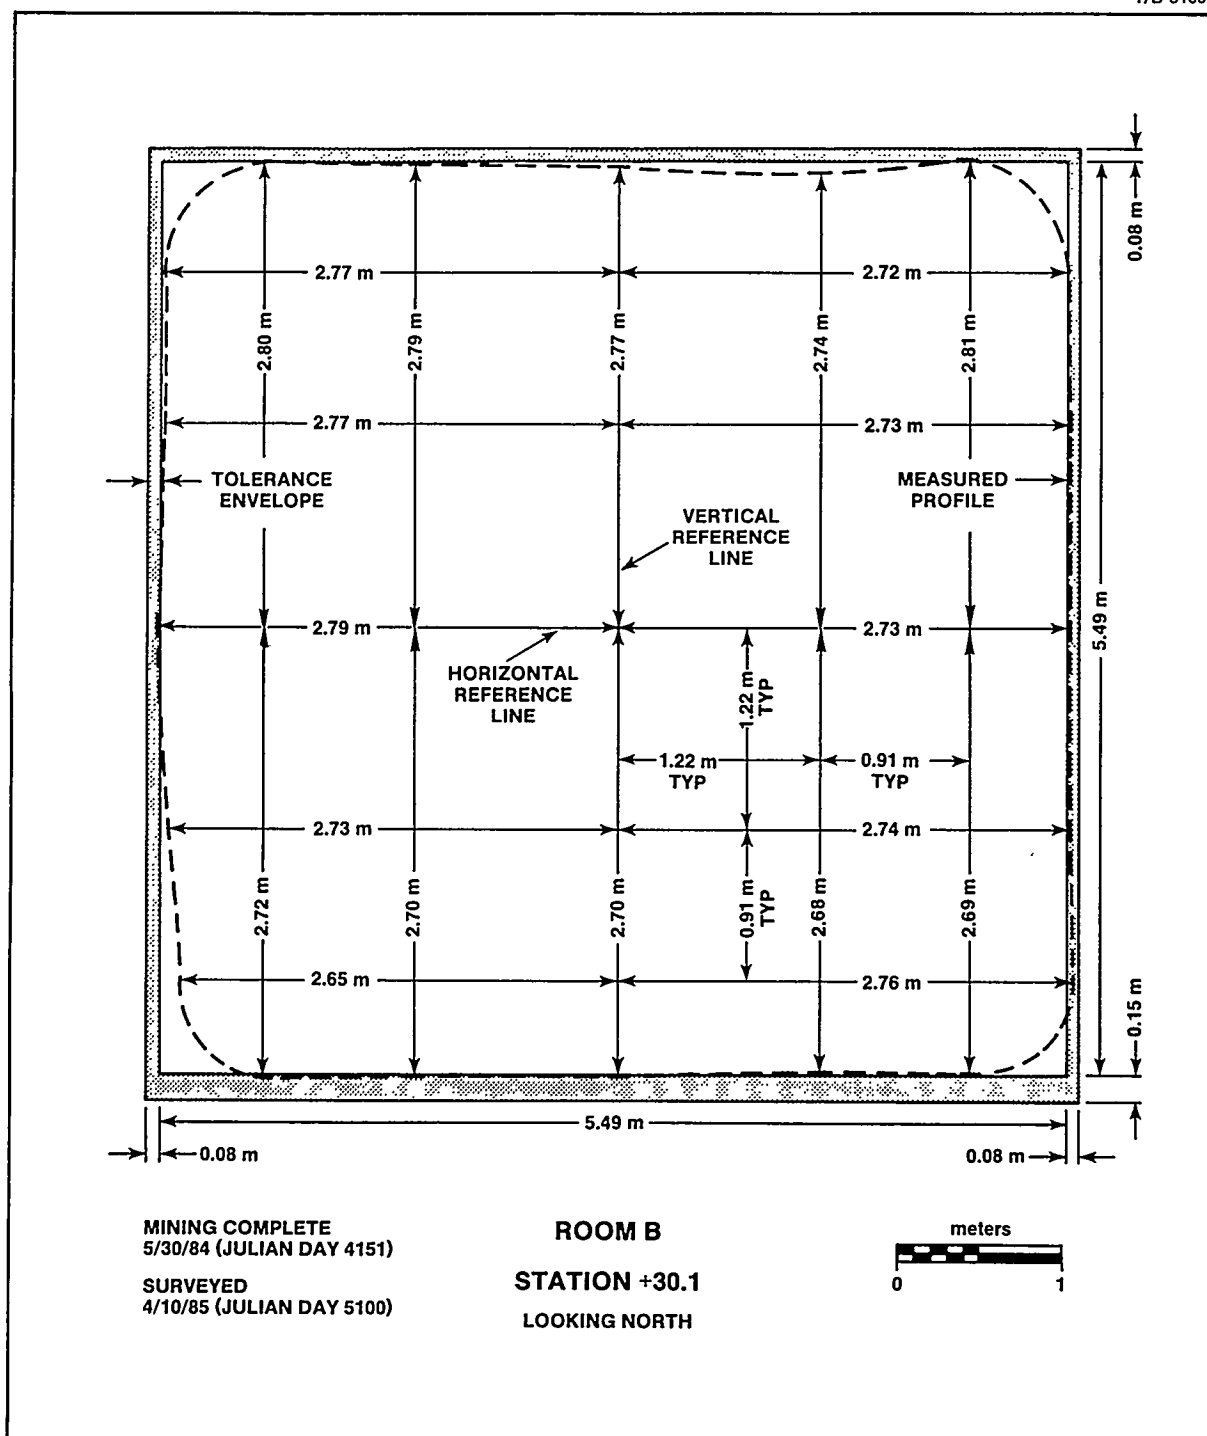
As-Built Cross Section of Station +30.1 m, Room B
